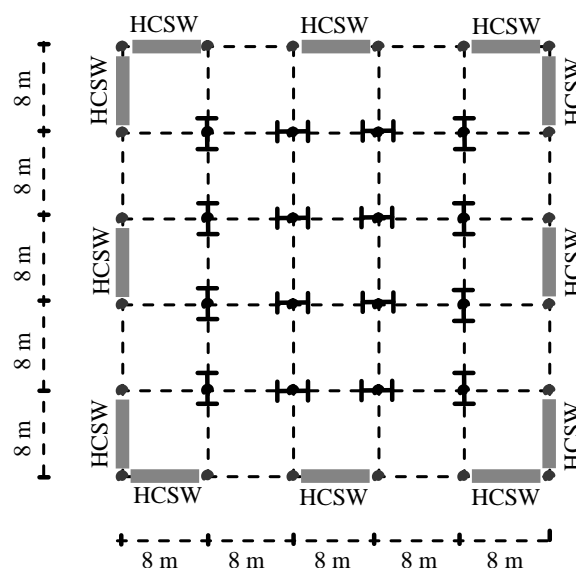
Floor geometry of the benchmark structures with positions of the HCSWs.
